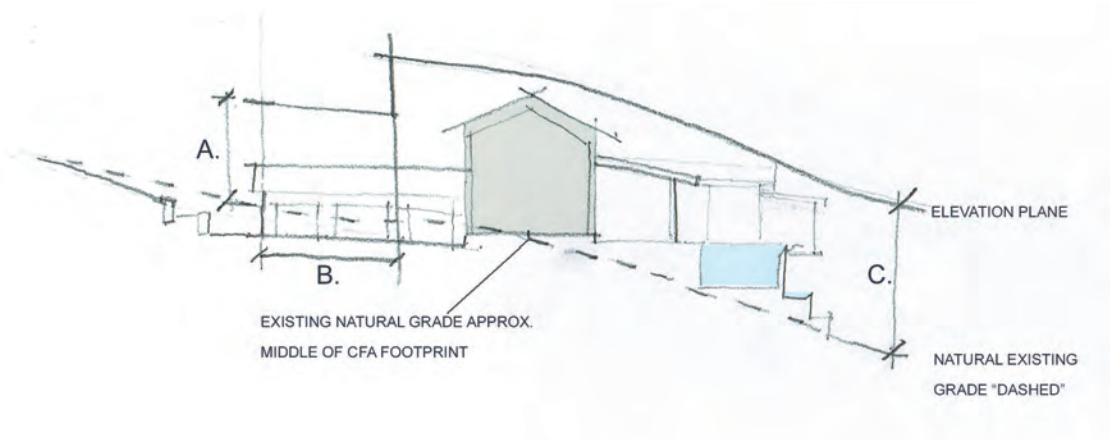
SITE SECTION EXAMPLE WITH ELEVATION PLANE
